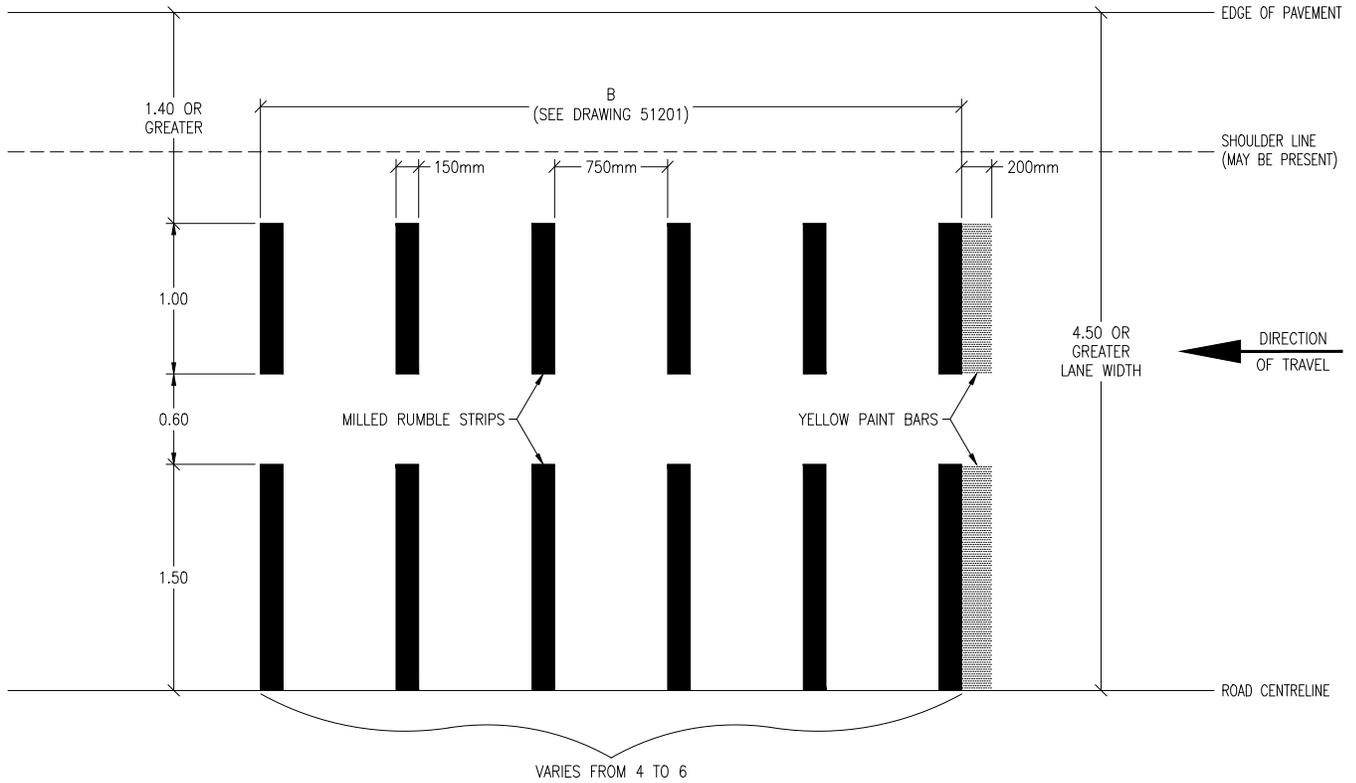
DETAIL MEASUREMENTS FOR DISCONTINUOUS RUMBLE STRIP LAYOUT
